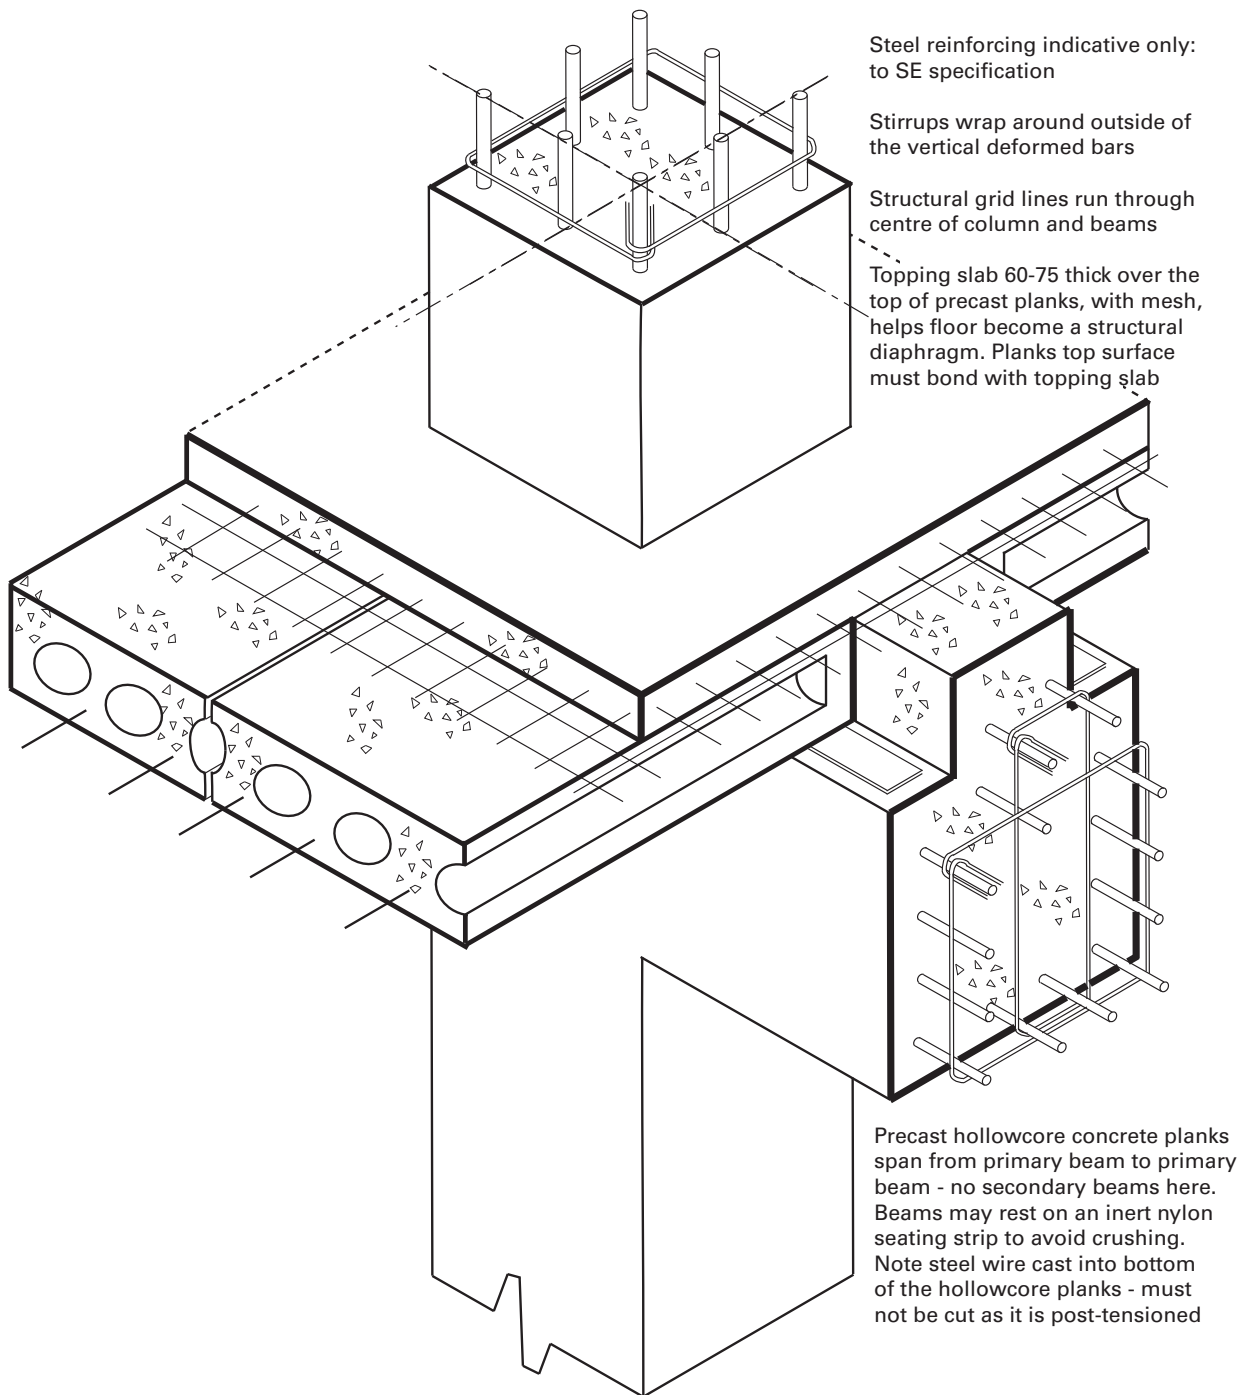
Typical concrete column/beam junction with hollow-core precast spans
